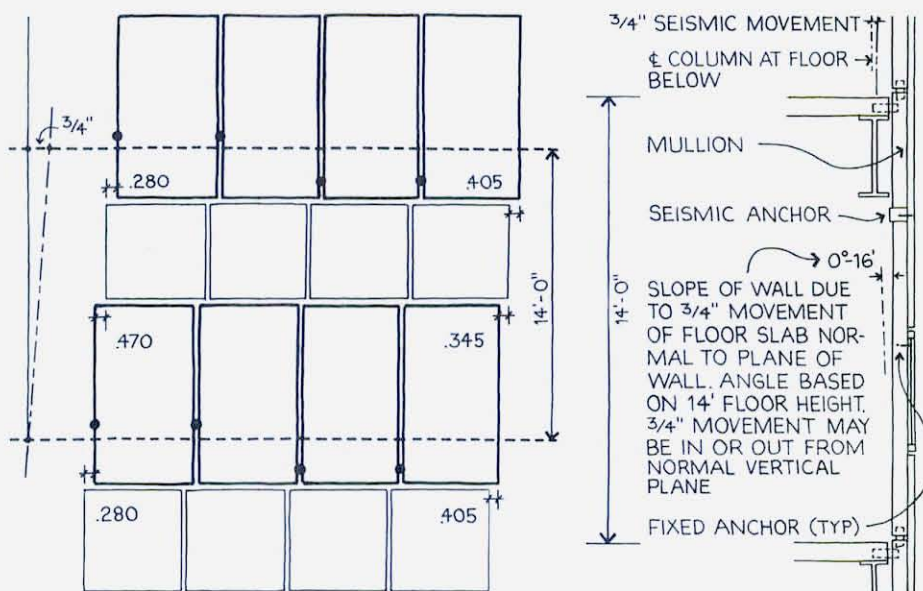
ELEVATION SHOWING LOCATION OF CURTAIN WALL CONNECTIONS AS DESIGNED BY SUBCONTRACTOR.
